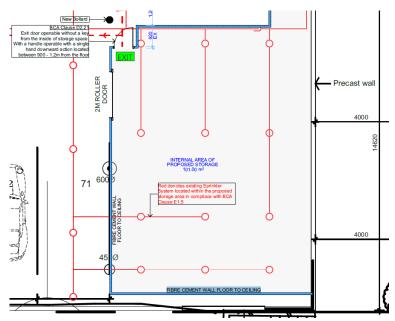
Proposed storage area, basement level B4 (source: Design Build Manage)
